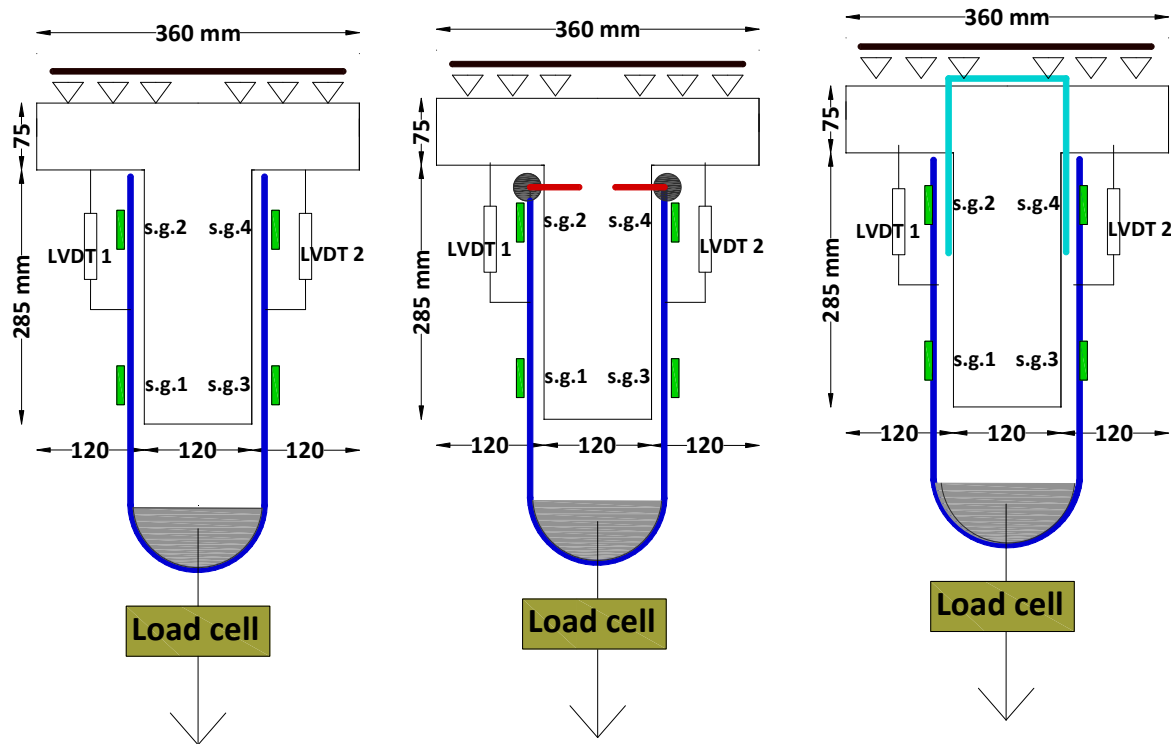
Testing three different open hoop CFRP strips employing unit T-Beam loading arrangement.
